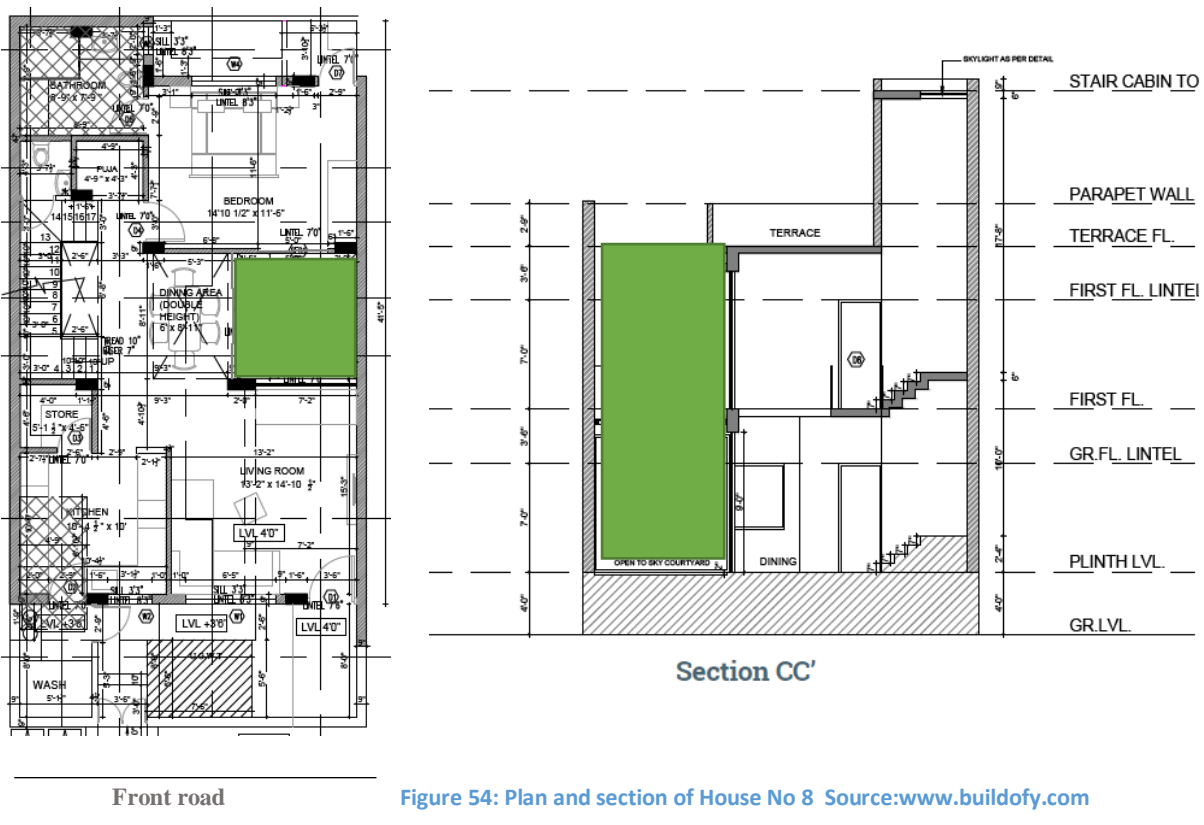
Plan and section of House No 8 Source:www.buildofy.com
